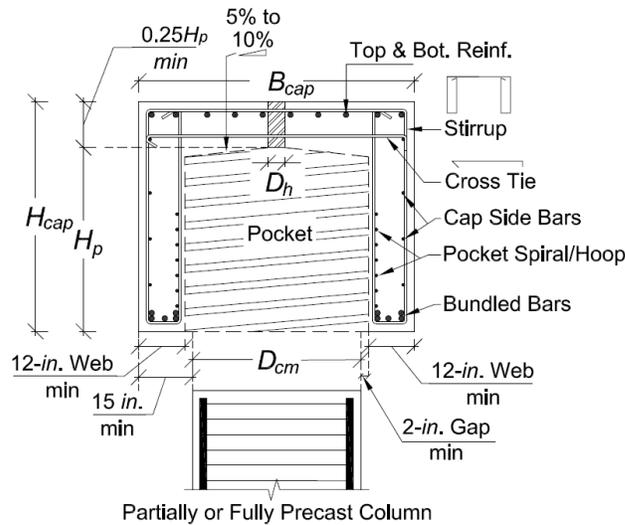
Detail of Bent Cap Pocket Connection
